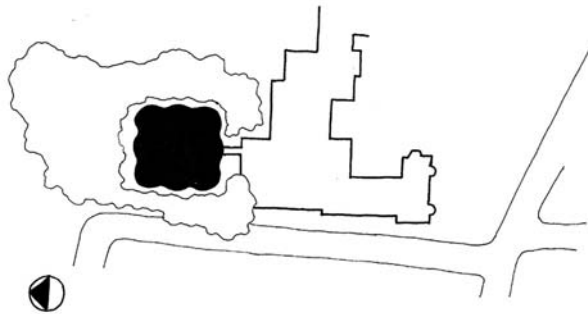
Site plan. Source: Drawing by Stephanie Travis, 2020.
